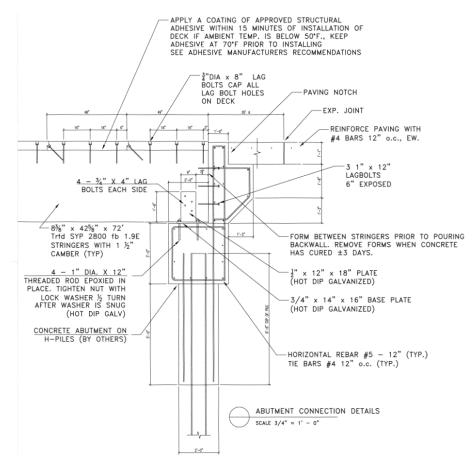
Cross-seciton of composite timber bridge abutment, page 3/3 in Appendix A
